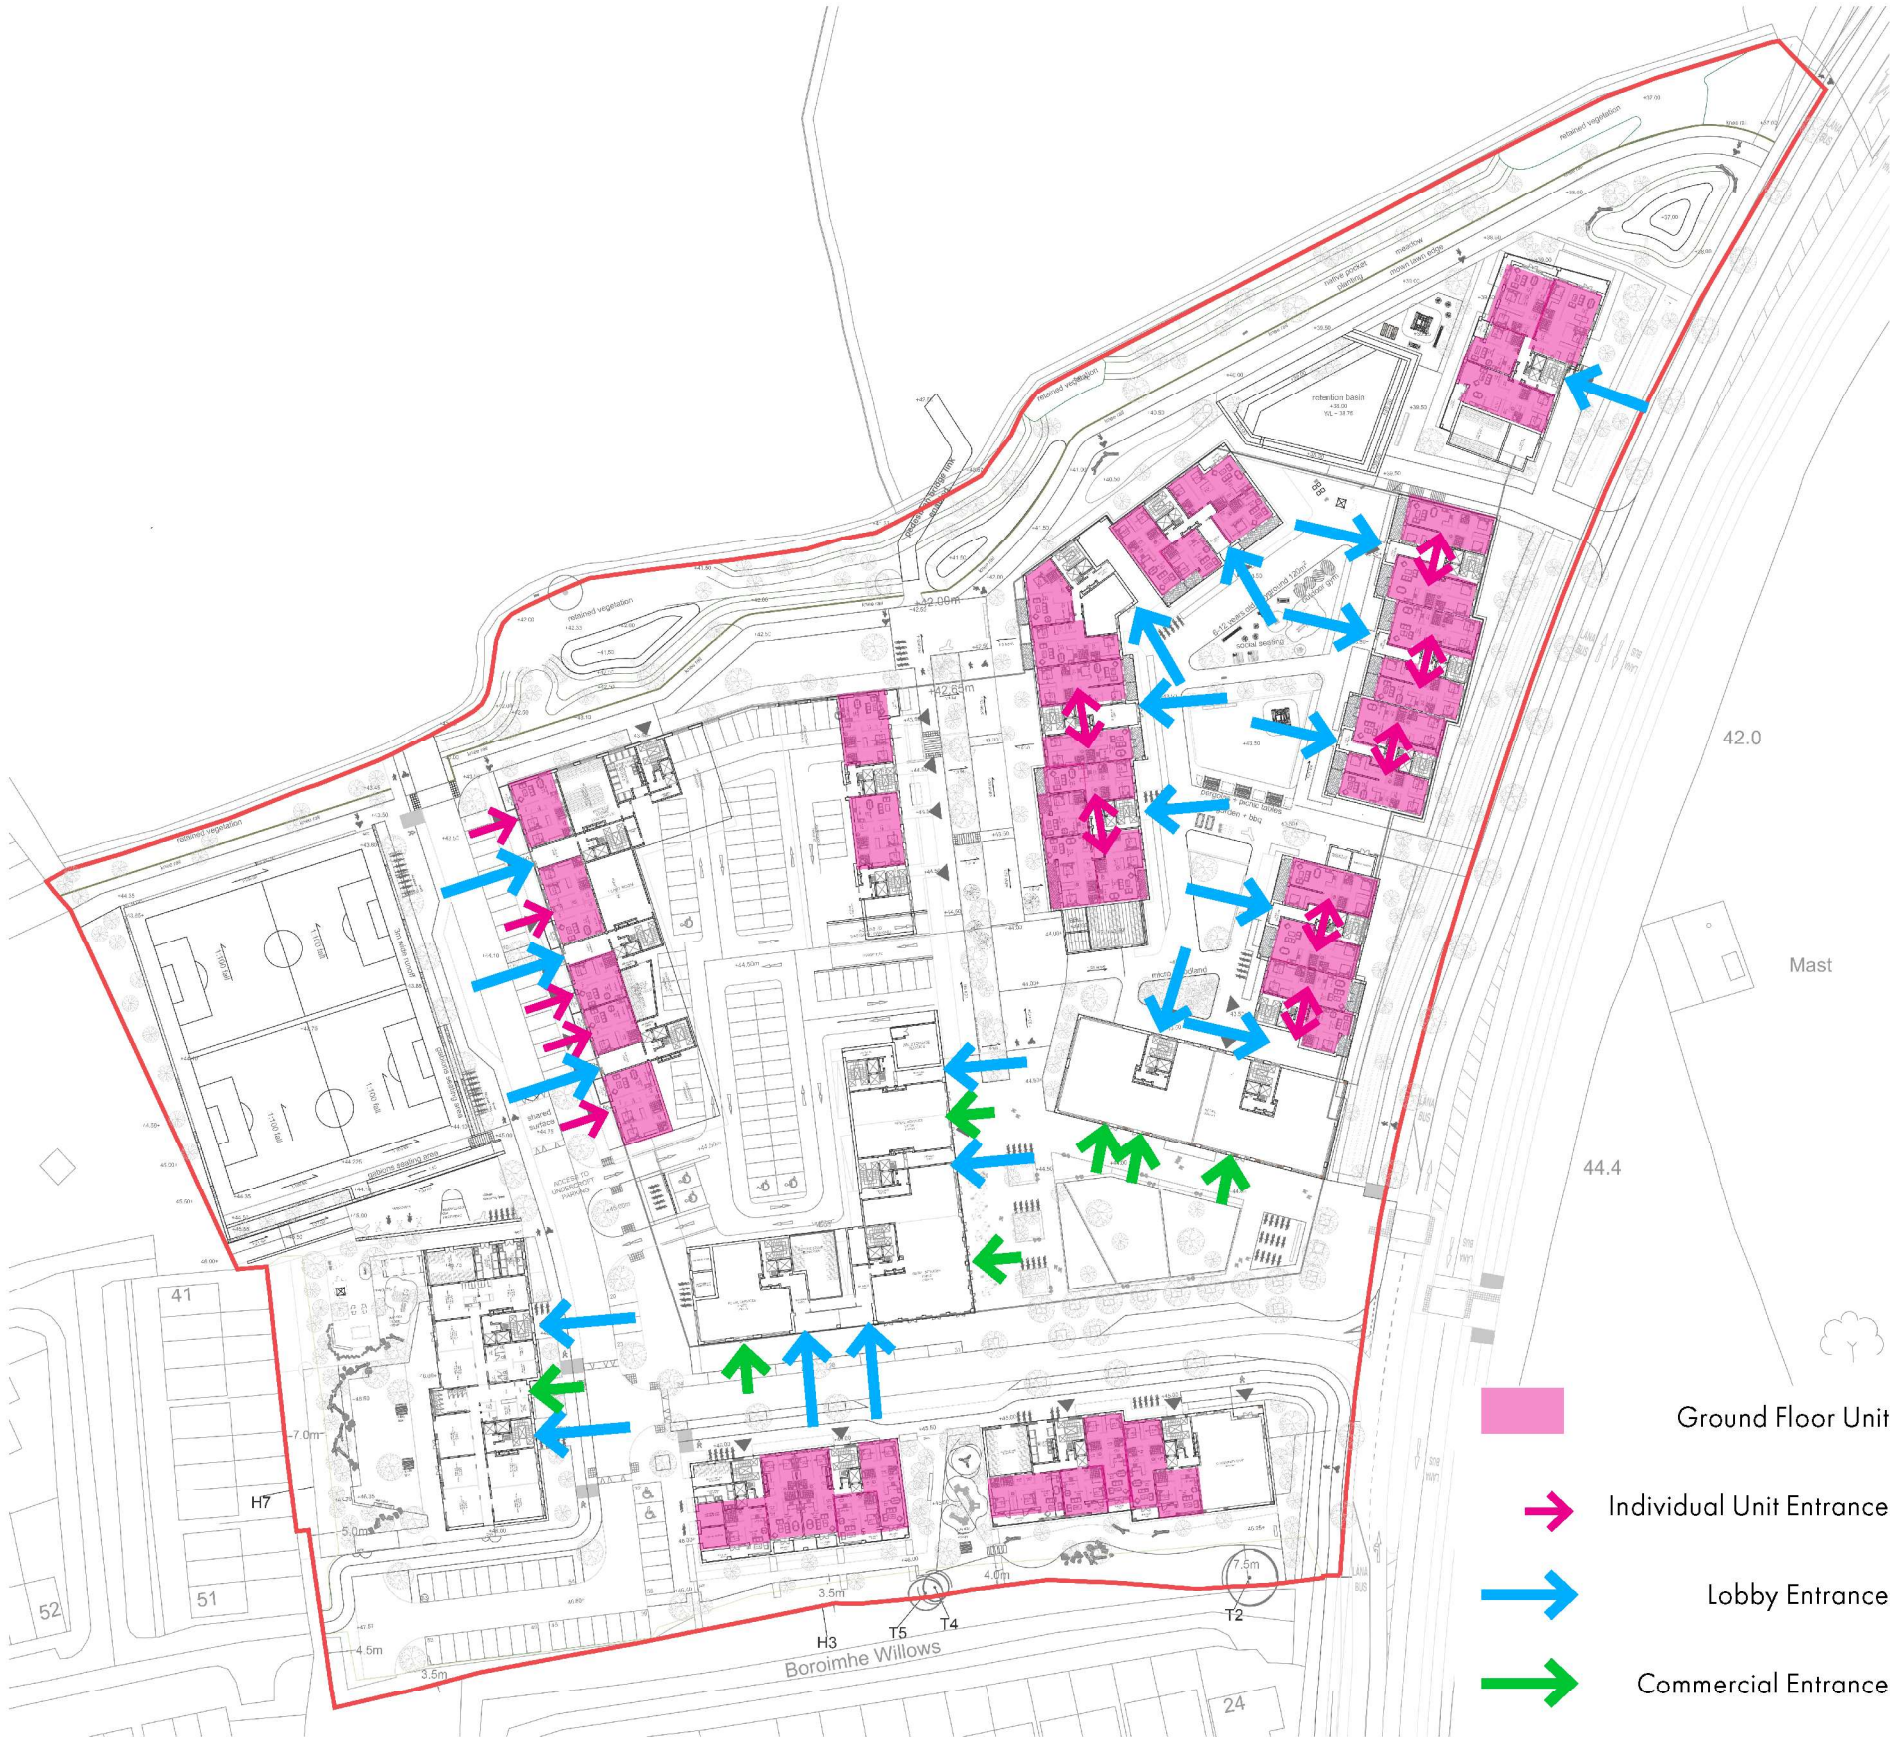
Plan diagram showing entrances and accessible ground floor units
